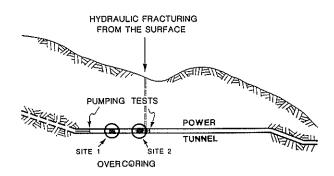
King River pressure tunnel. Vertical section, showing sites for overcoring and pumping tests.
